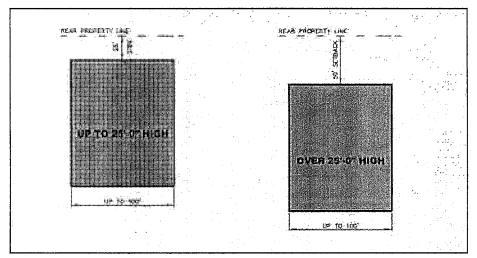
Setbacks for Buildings up to 100' wide on East side of Federal Highway
